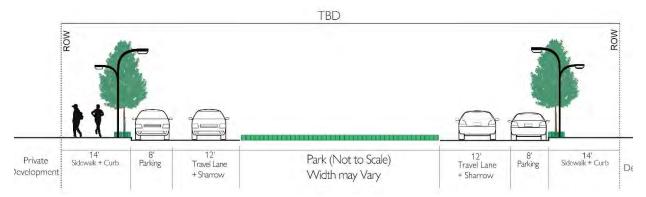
Green Loop: 59th Avenue NW Concept 1 (Existing ROW)
